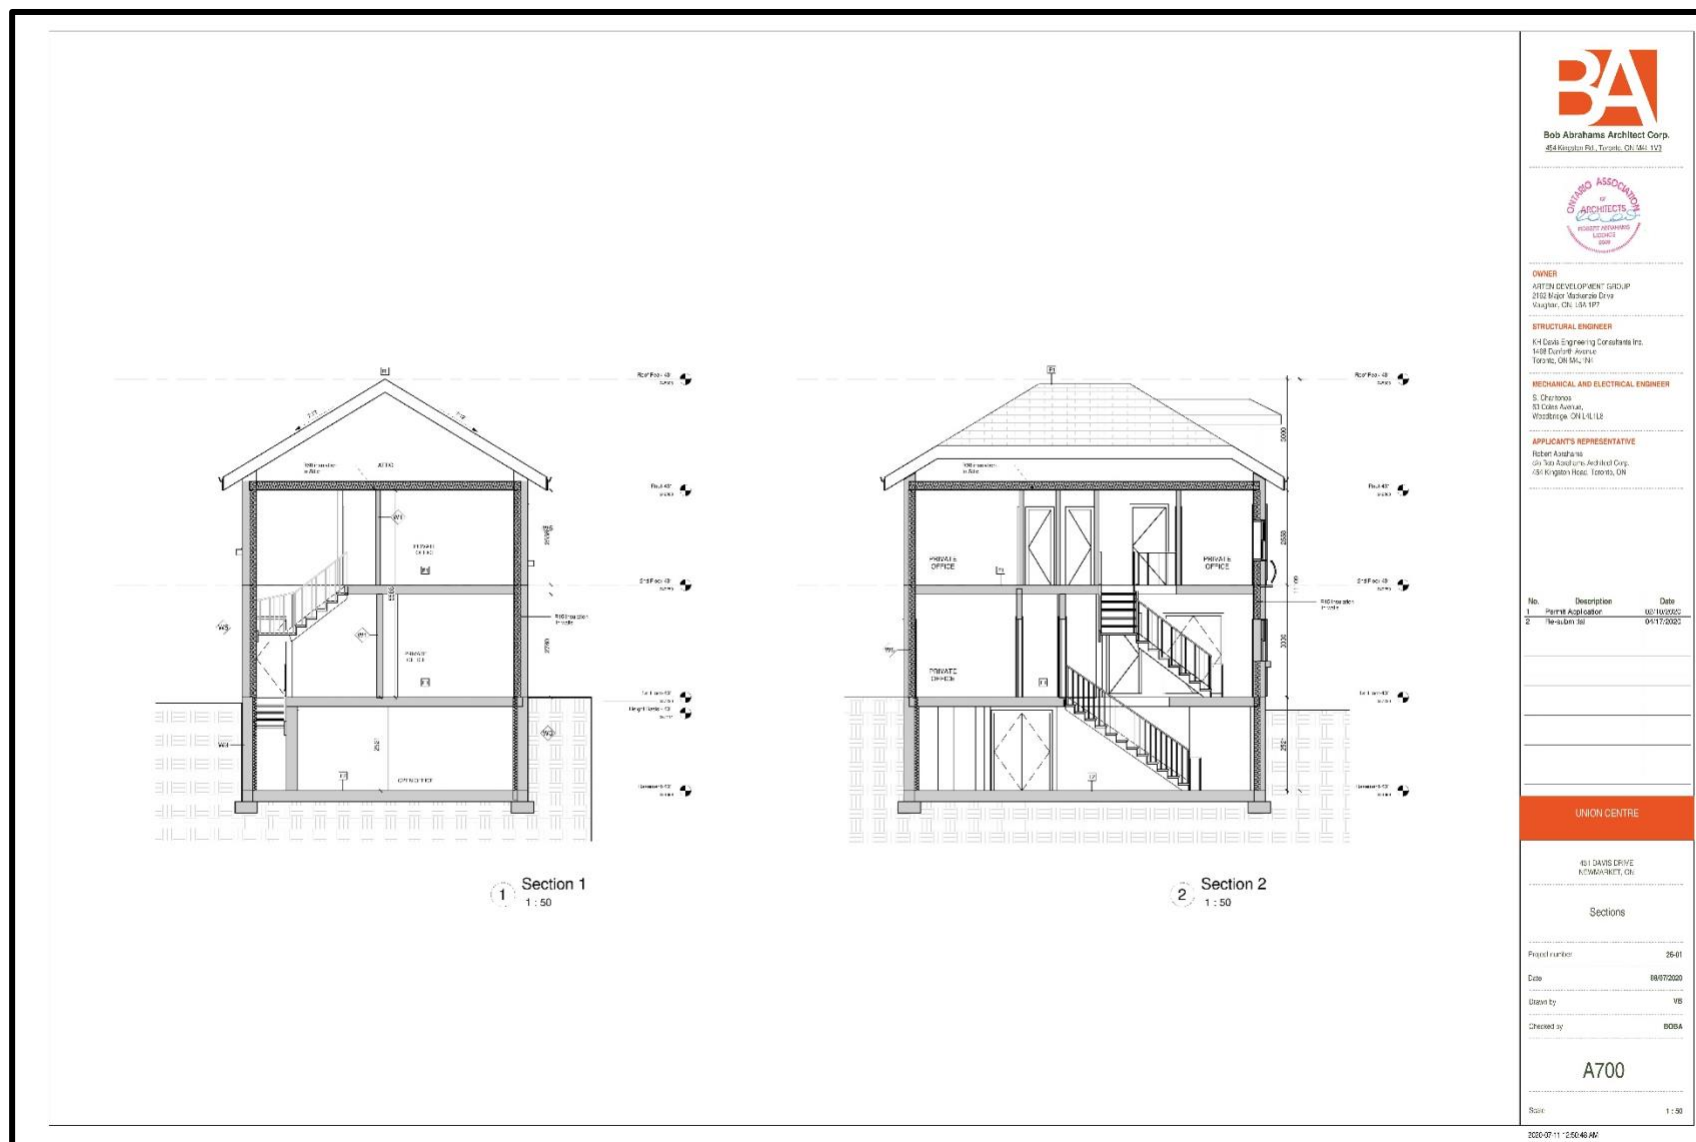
Proposed Cross Section Layout for 425 Davis Drive
